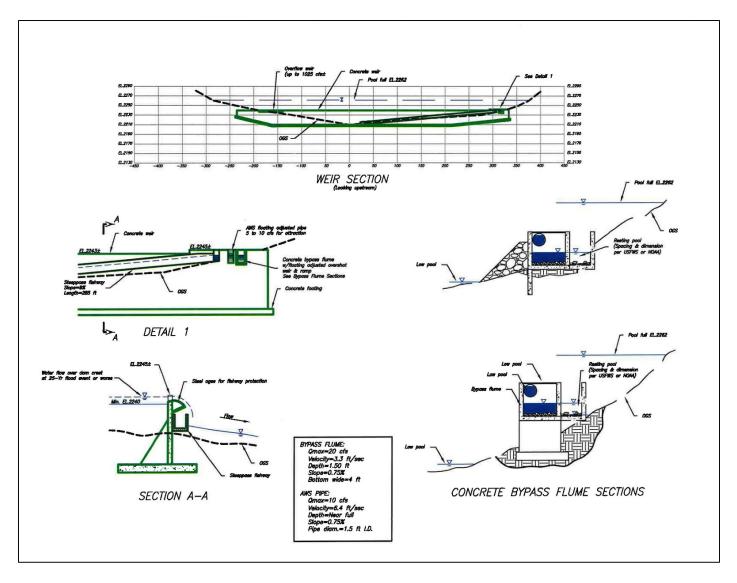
OPTION 7 - The Narrows: Full Span Concrete Weir and Fishways cross sectional view of channel design
